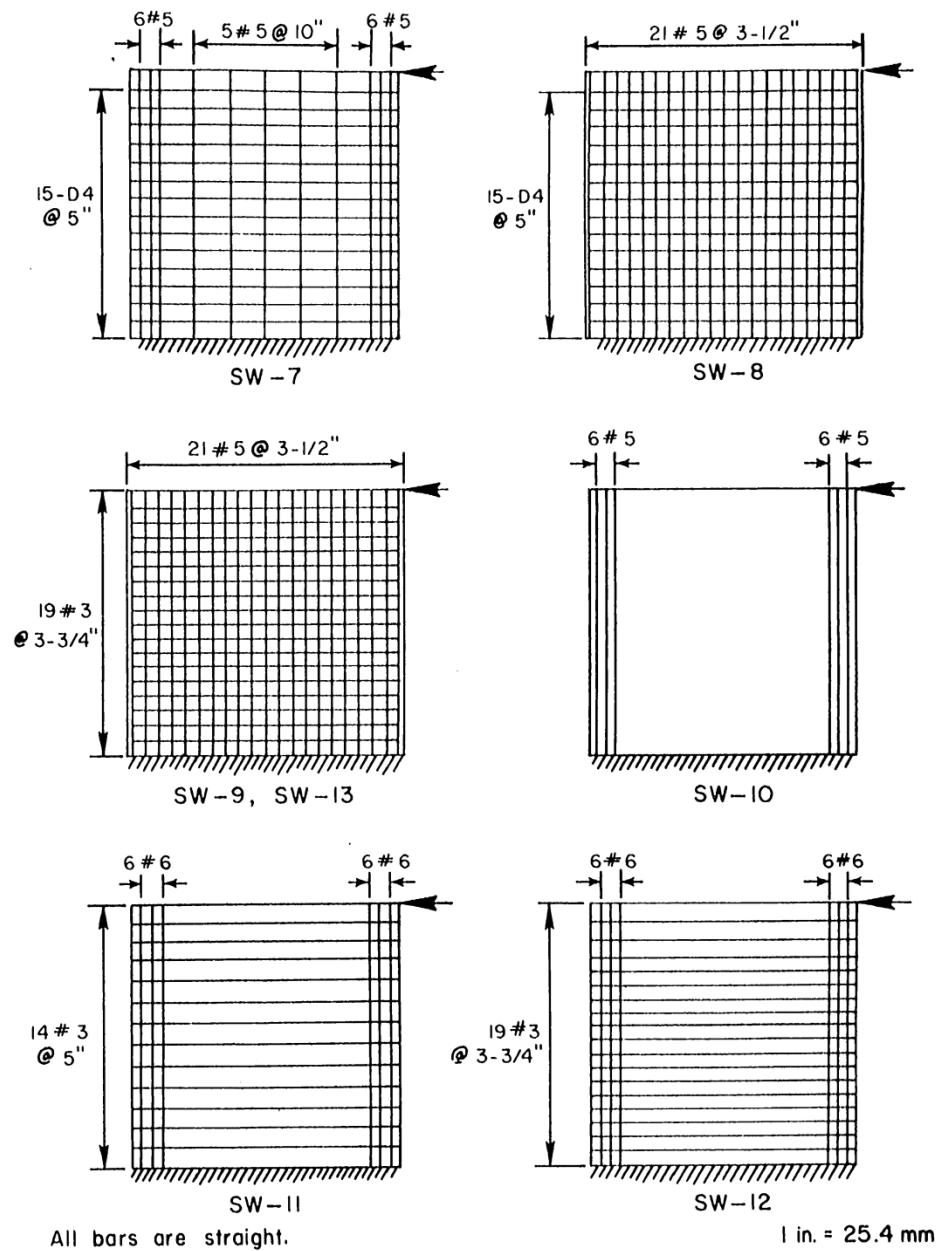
Reinforcing Detailing for the Wall Specimens Tested by Cardenas et al. (1980)
